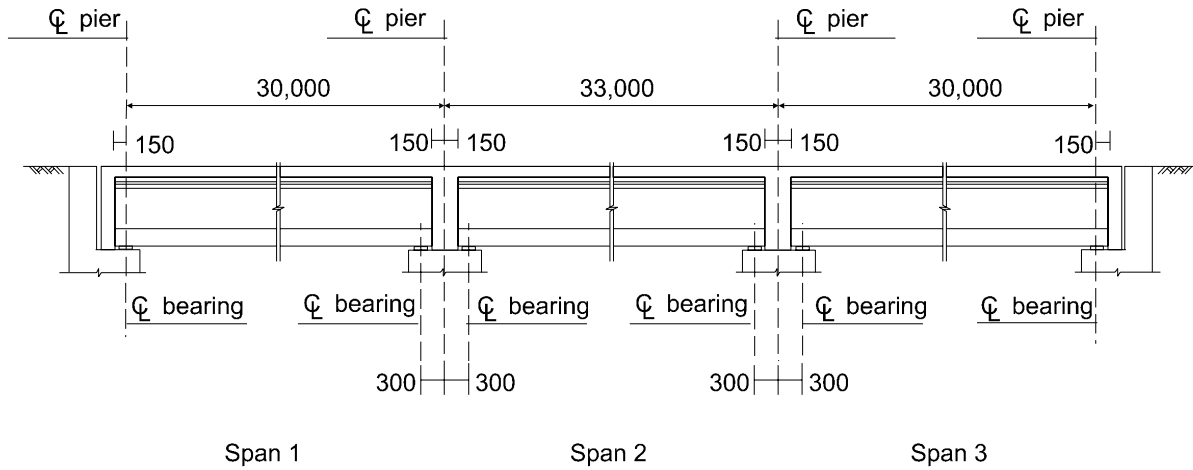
Elevation (all dimensions are in mm.)
